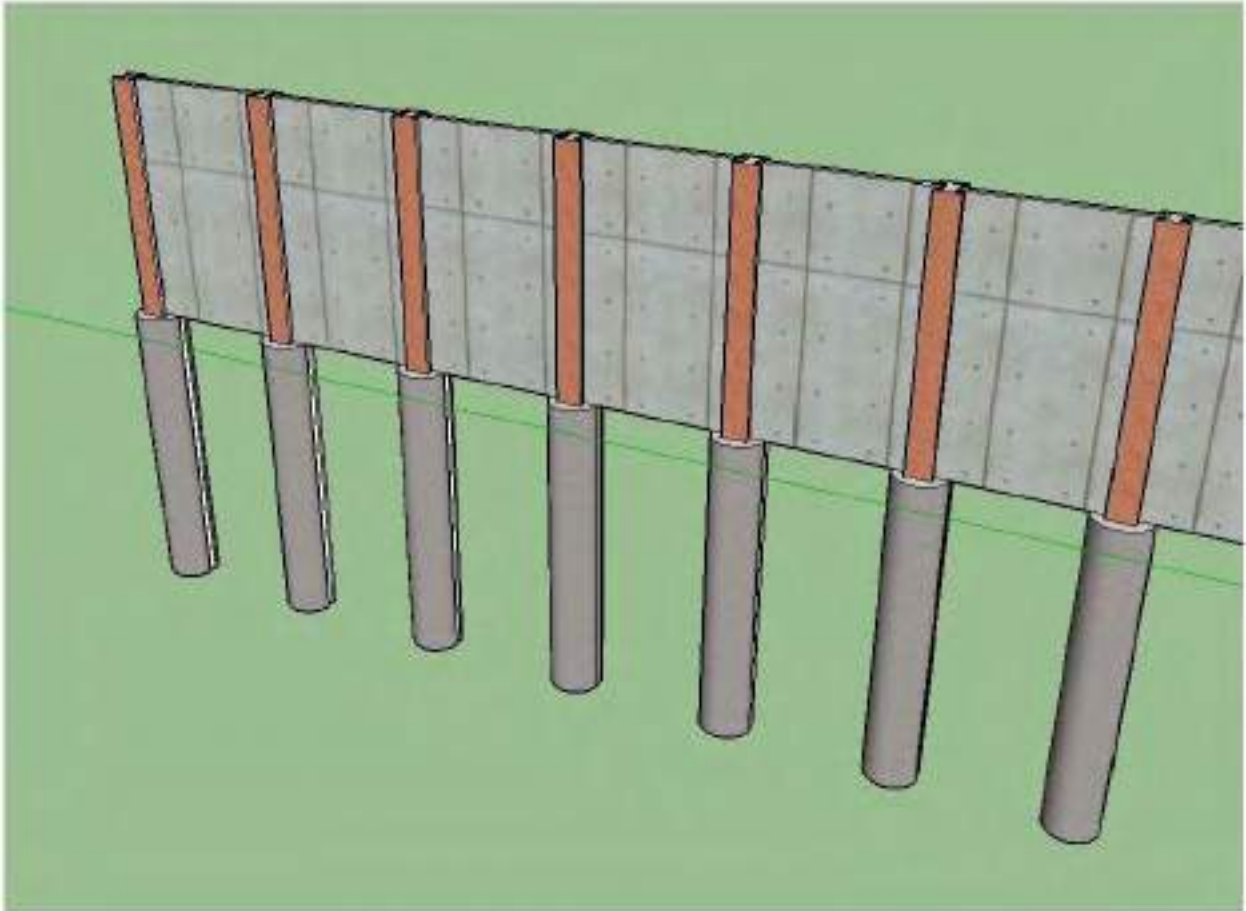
Drilled Soldier Pile & Lagging Typical Drawing
